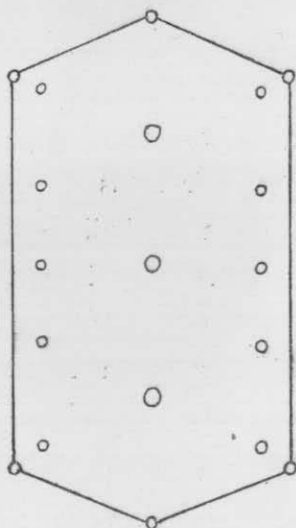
Ground-plan of a dwelling-house in Yap.
